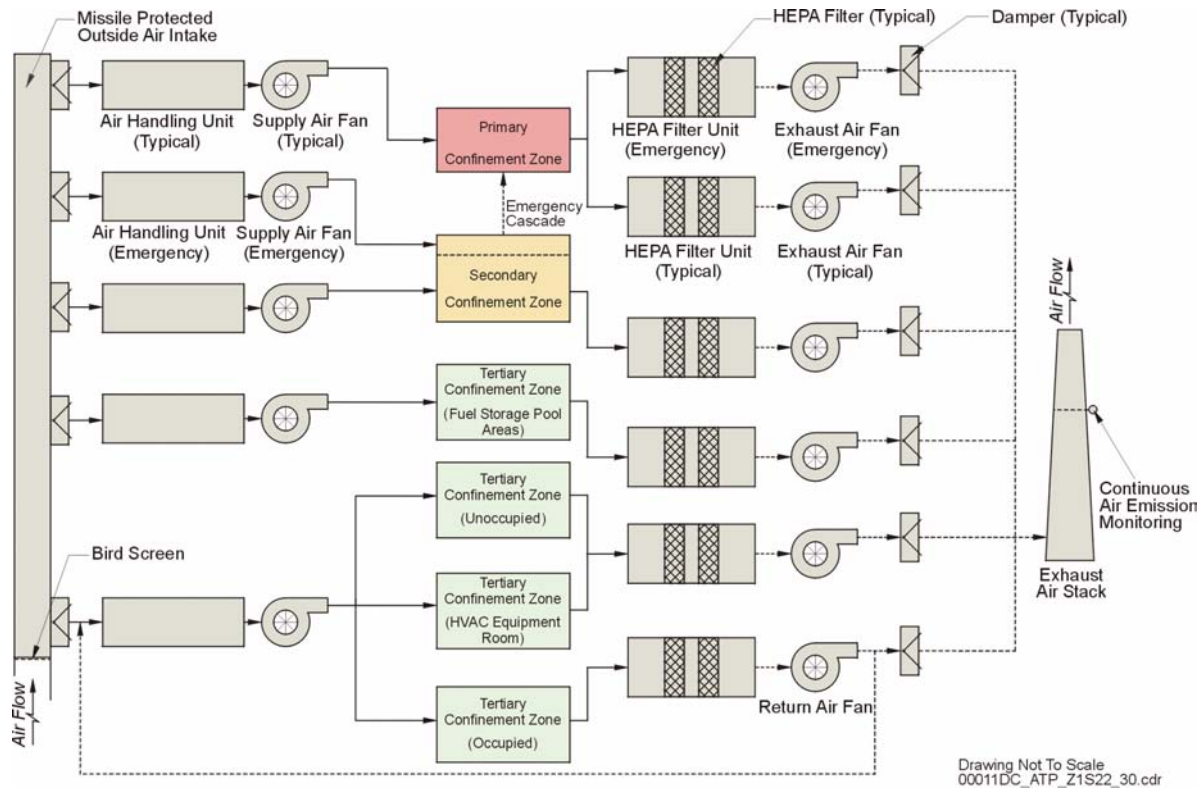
Waste Handling Building Heating, Ventilation, and Air Conditioning Confinement Flow Diagram
